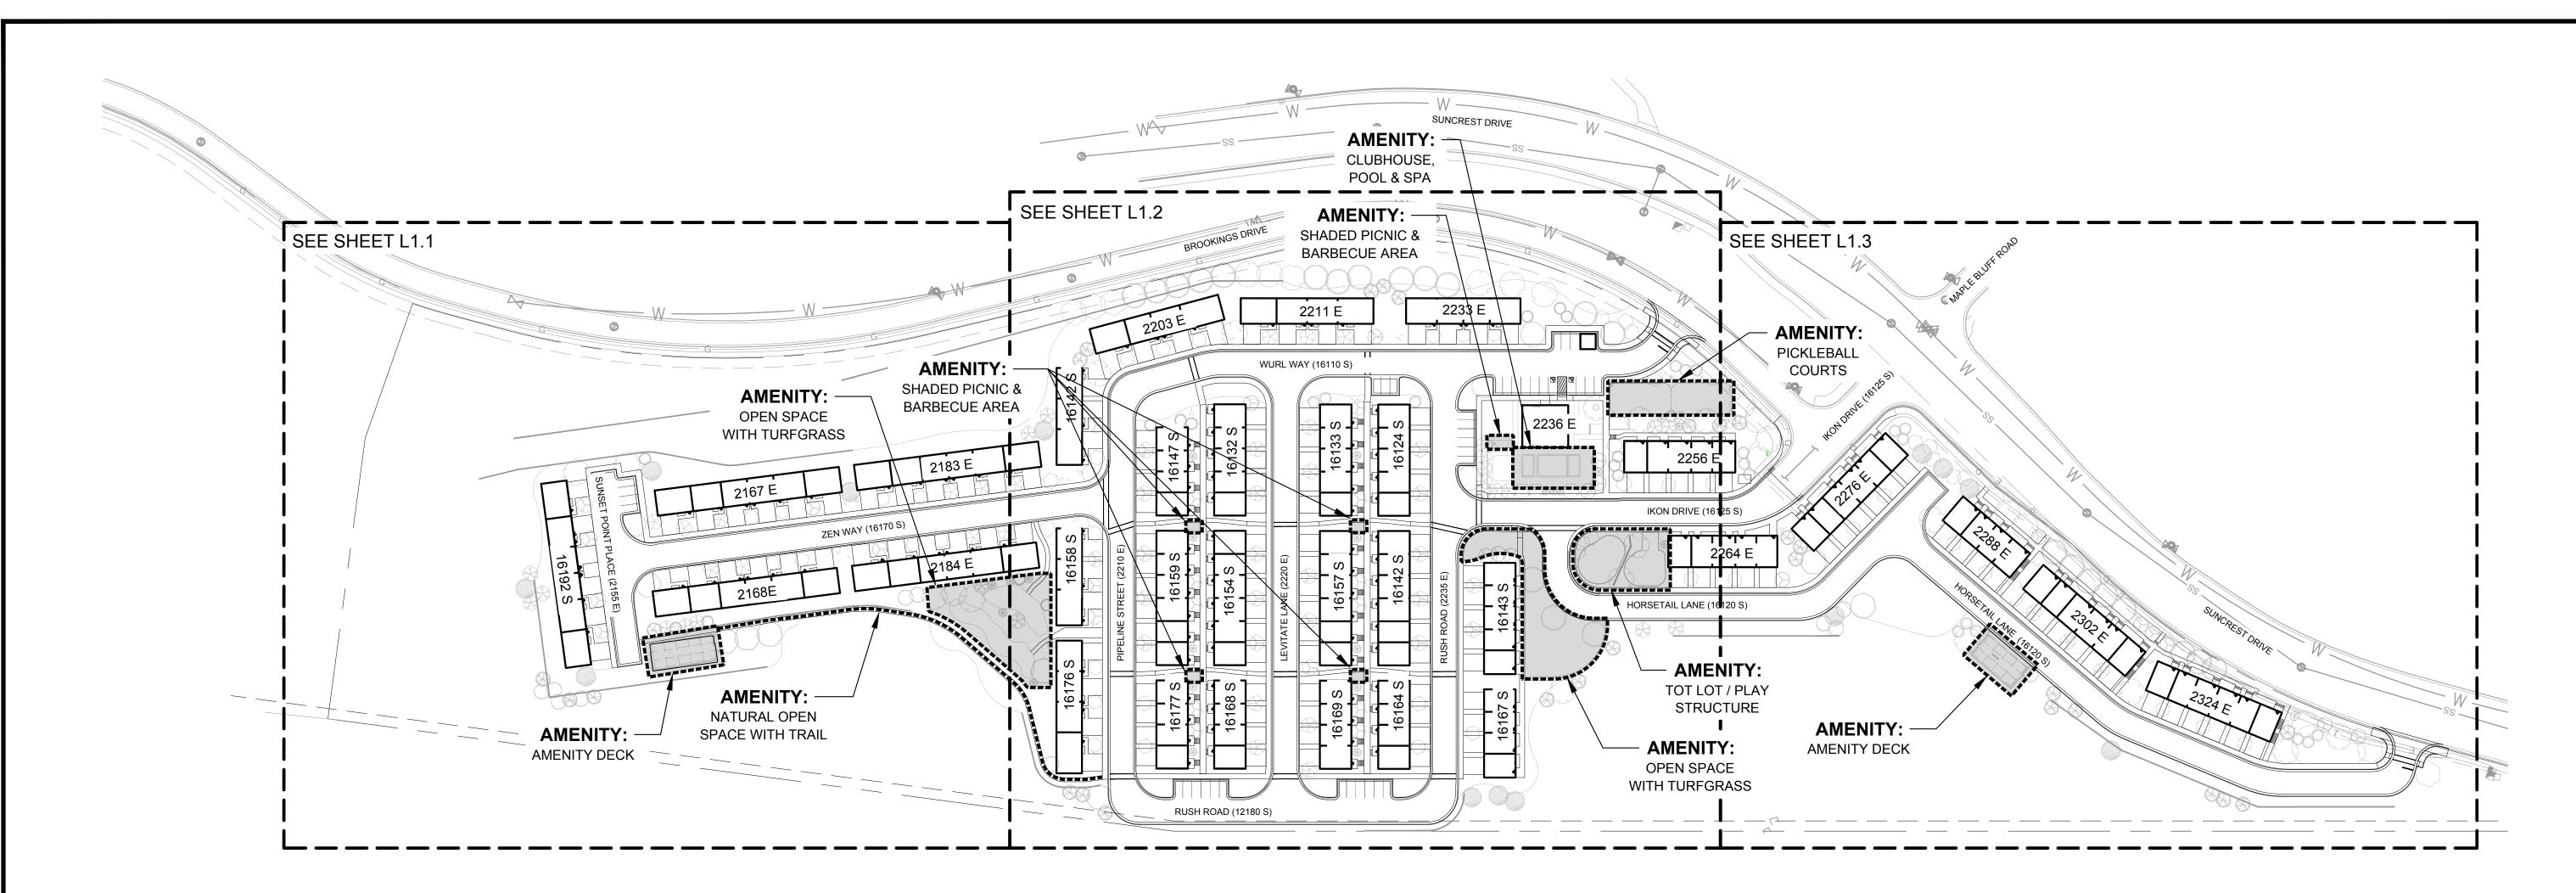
EXHIBIT G LANDSCAPE AND AMENITY PLAN
